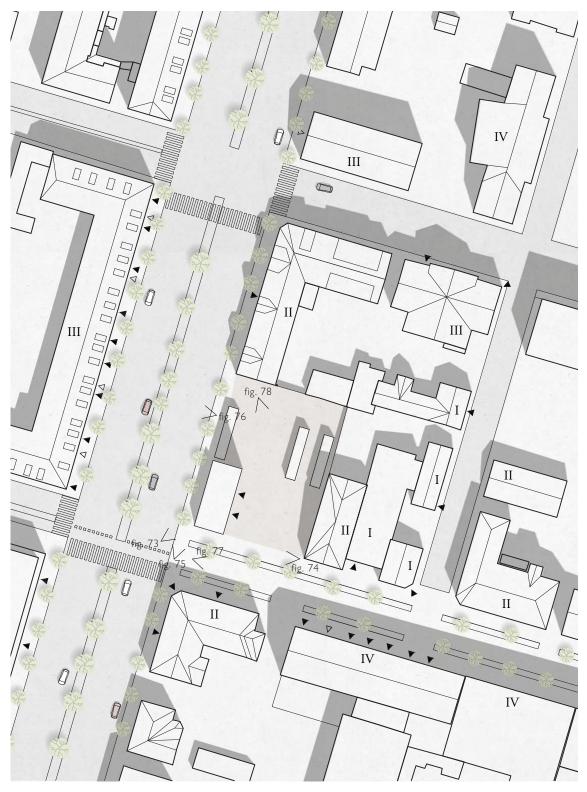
Siteplan showing the site with surroundings today, 1:1000.
